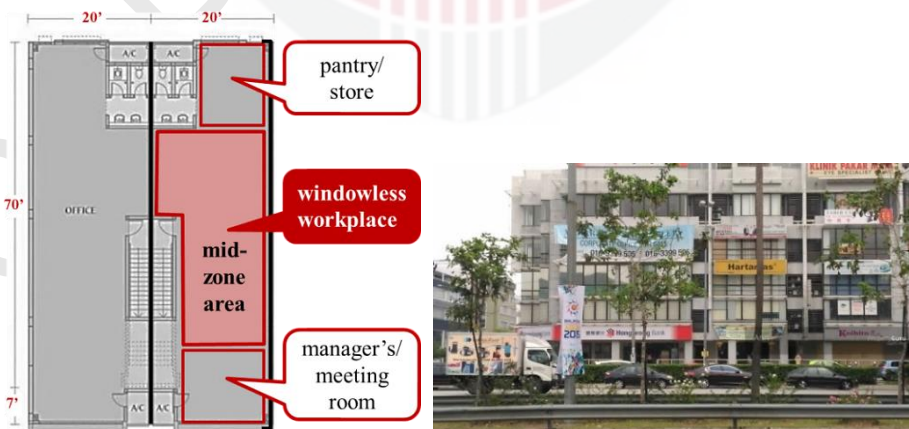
Example of Intermediate Shop-Lots in Malaysia - Typical Layout Plan (zoning of spaces) and Front Elevation (basic façade design).
